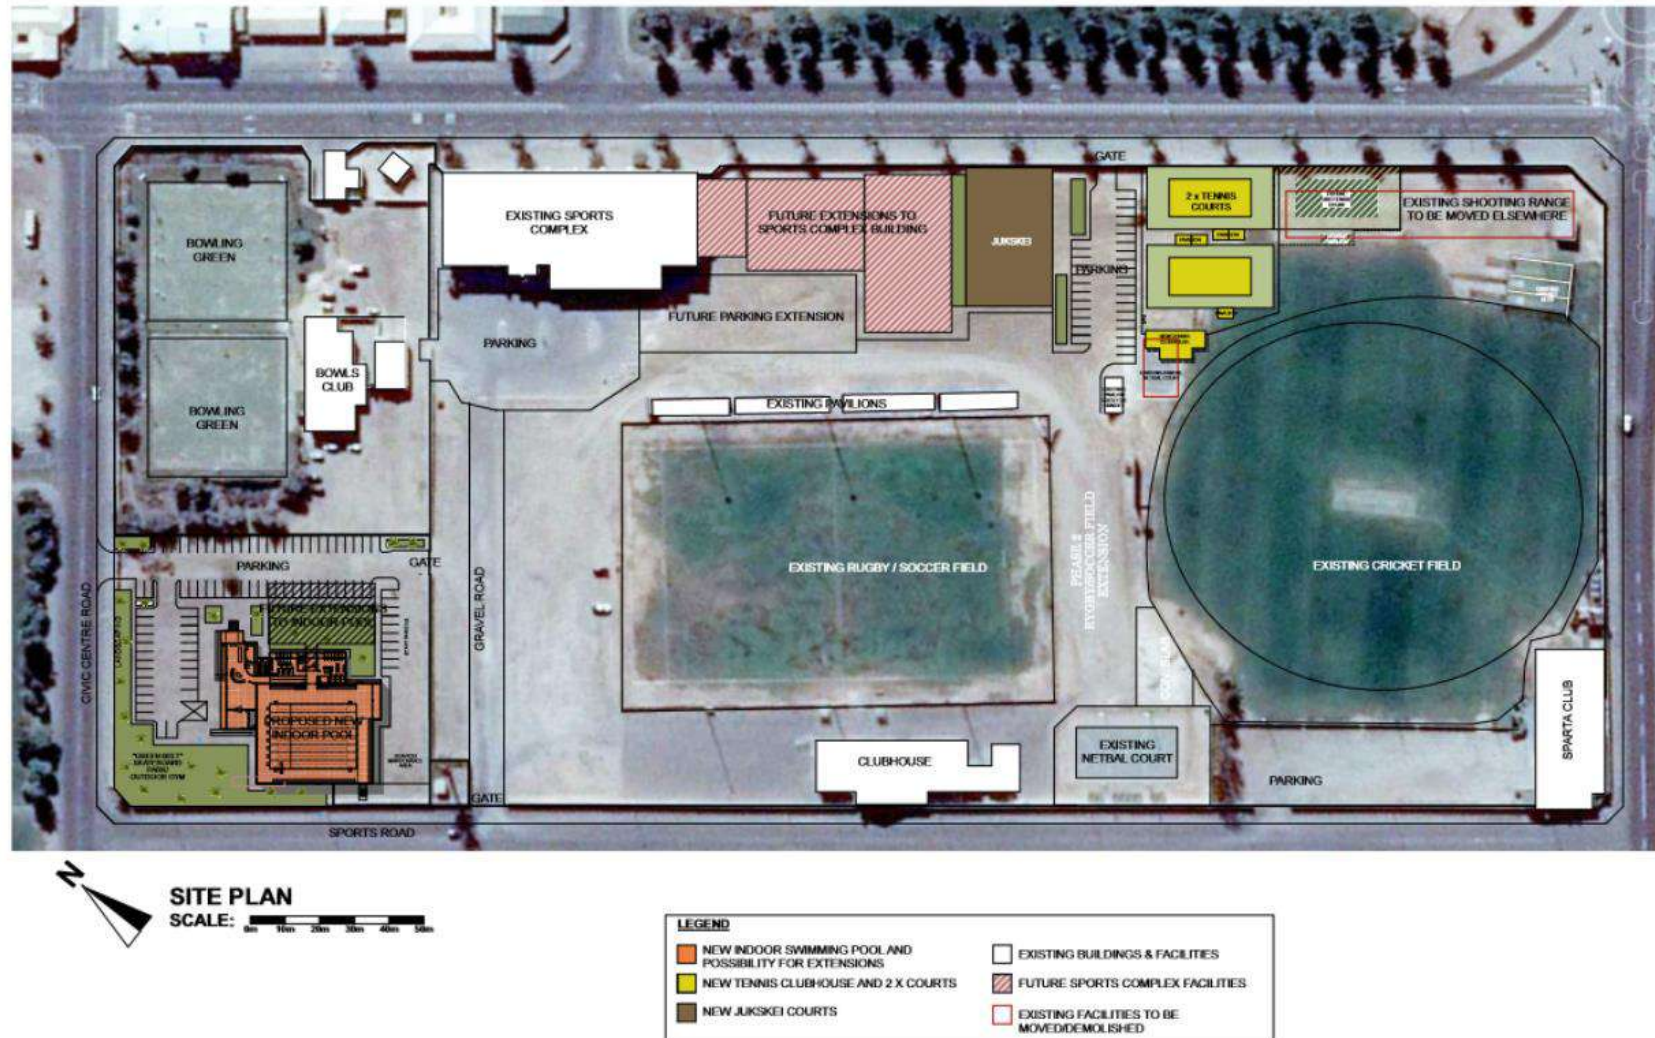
Proposed Layout for Relocated Sporting Facilities at Jan Wilken Stadium
